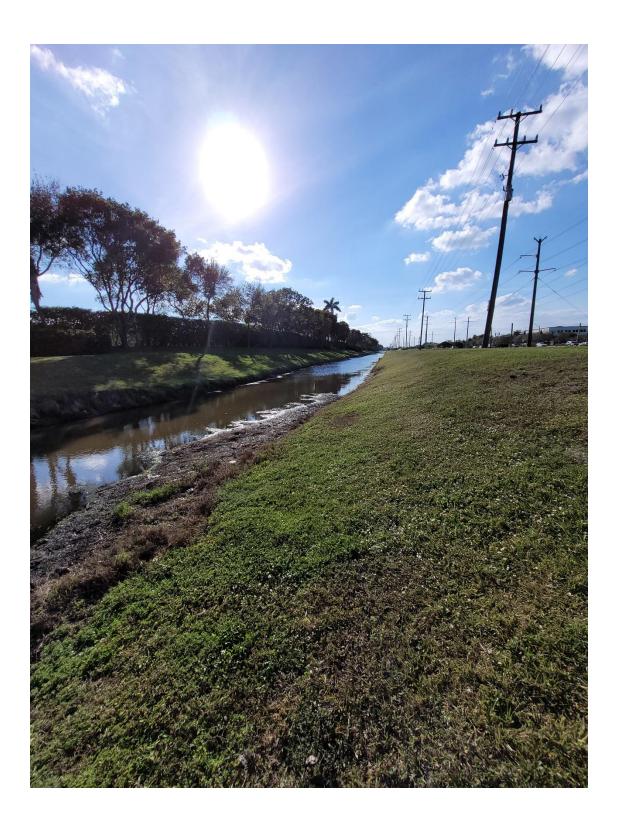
East/west canal parallel to Sheridan Street and west of NW 72nd Avenue, looking west. The photo indicates sediment build up along the north bank of the canal, within the scope of the NW 72nd Avenue canal restoration project.
